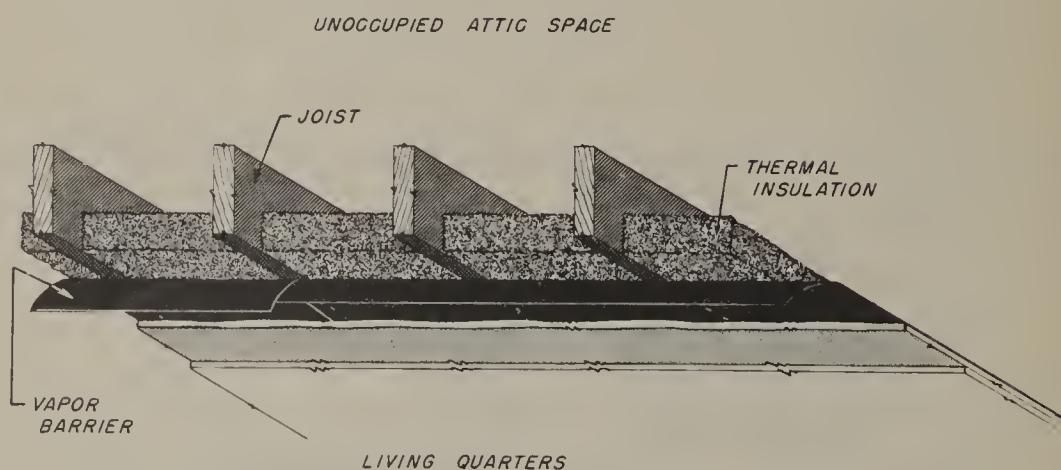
Ceiling construction adjacent to an attic space.* Condensation control is obtained through the use of a vapor barrier applied below the joists and running parallel to them prior to the attachment of the ceiling. The thermal insulation may be fill or batt type placed after the ceiling finish has been applied.
